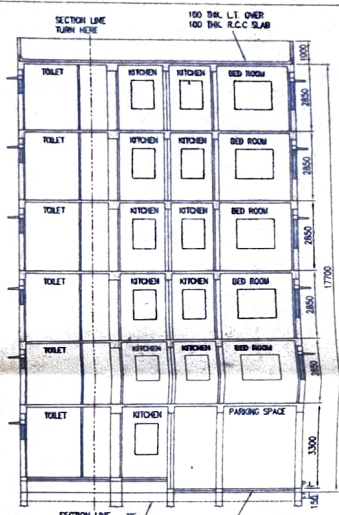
DETAILS OF FLOOR PLANS, SECTIONS, ELEVATION, SEPTIC TANK, CHLORINATION CHAMBERS, & SITE PLAN AND S.I.G. TANK.
